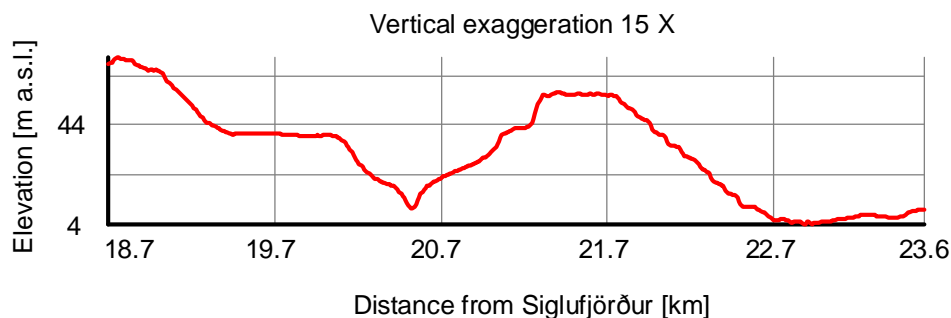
Vertical section of road section 931: km 18.7-23.6 – south of Hraun to Ketilás
